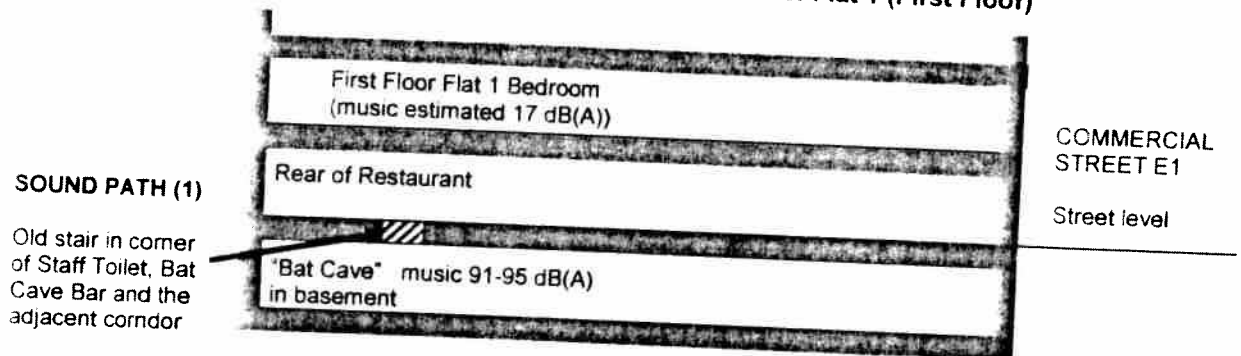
Illustrative Section through Building Edge (basement), Restaurant (ground floor), and Flat No. 1 (first floor)
